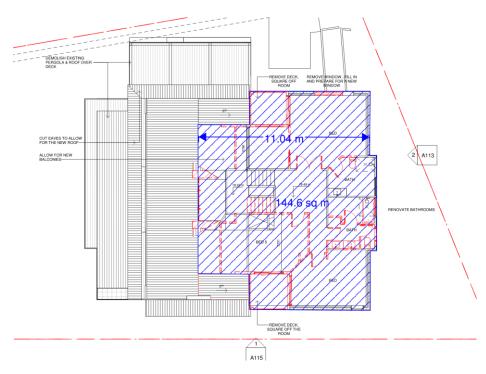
existing floorplate of the upper building level; the floor plate is 11m deep and approx. 144m² in area
